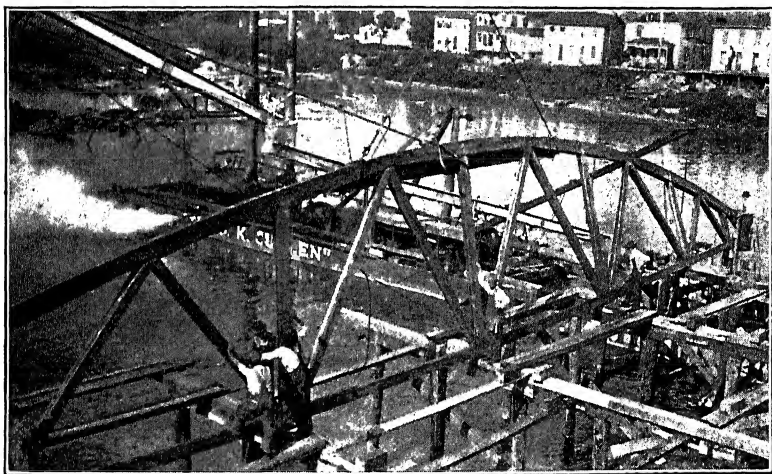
B.—Centering for High Street bridge, Hamilton, Ohio.
